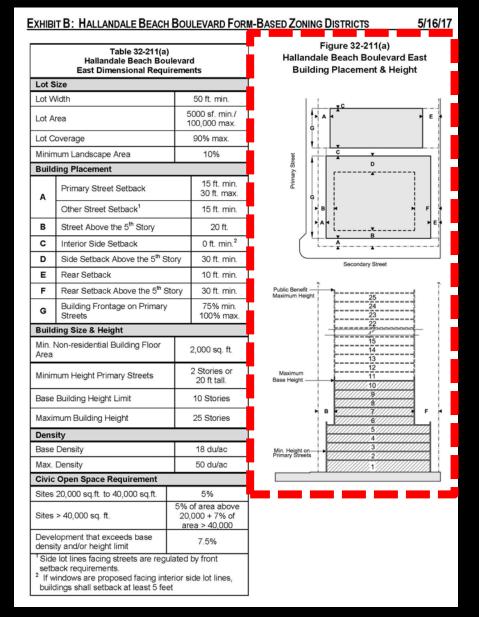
(a) Hallandale Beach Boulevard East Building Placement & Height D Secondary Street Public Benefit Maximum Height 13 12 Maximum Base Height 10 F
